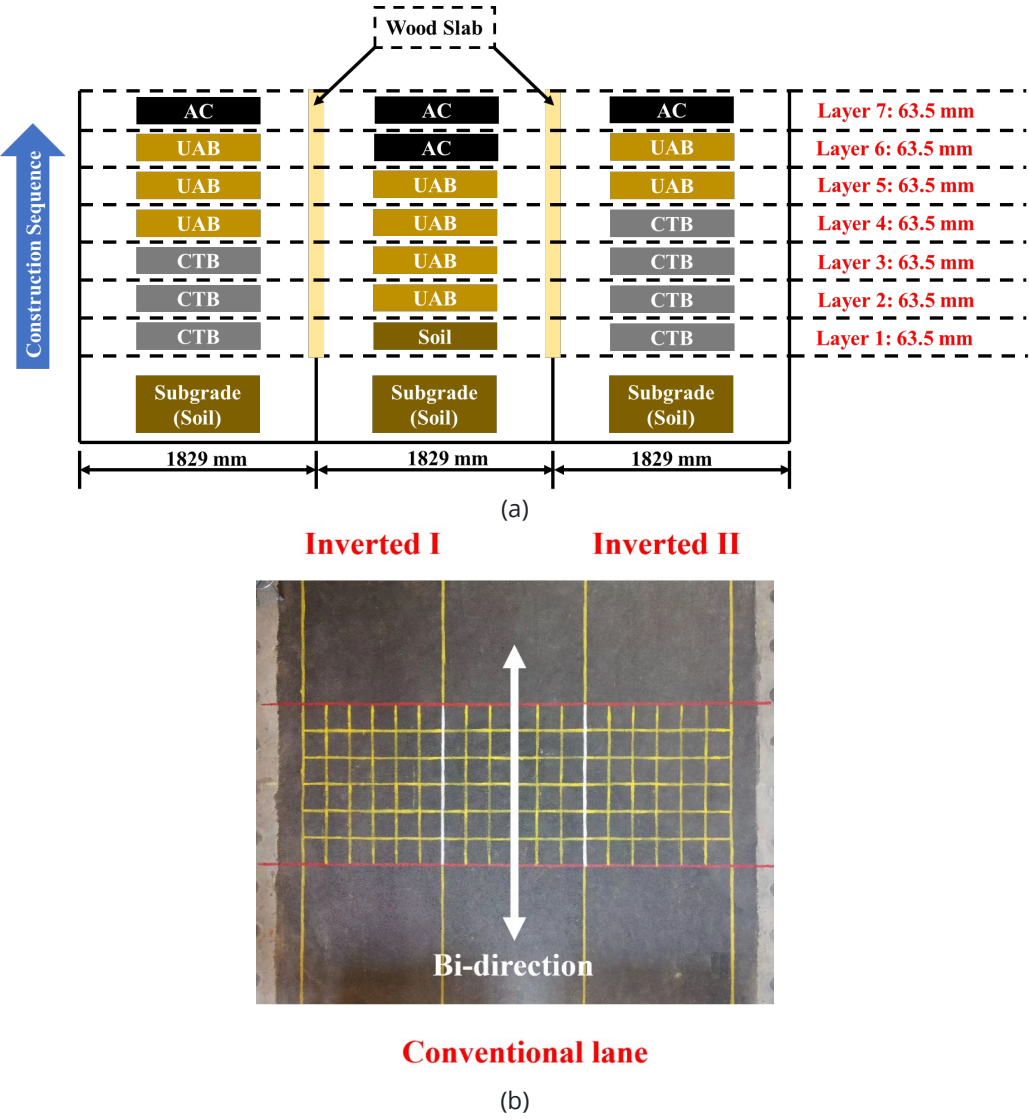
(a) The schematic design of testing pavement; (b) Testing pavement lanes for APT
